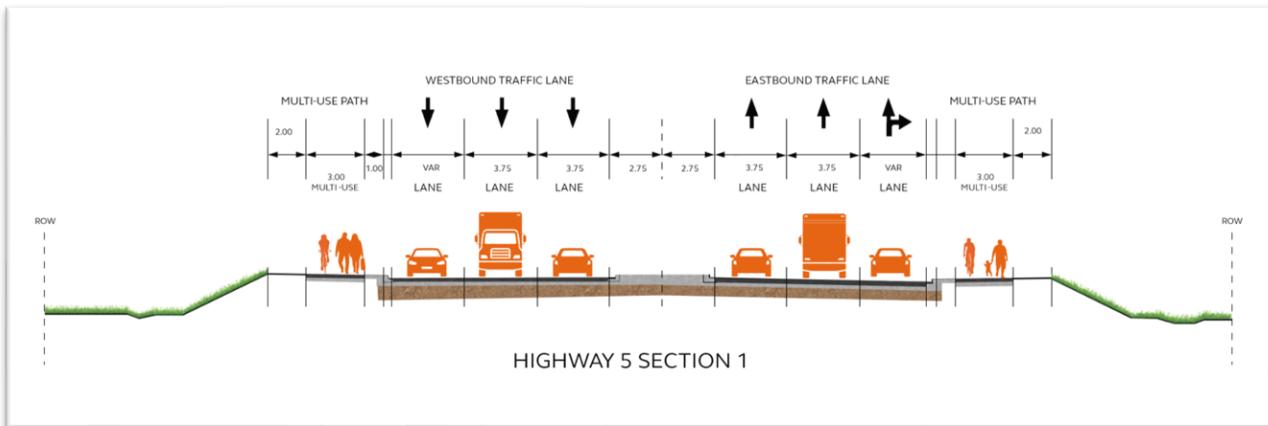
Highway 5 – New Construction West of the New Interchange
